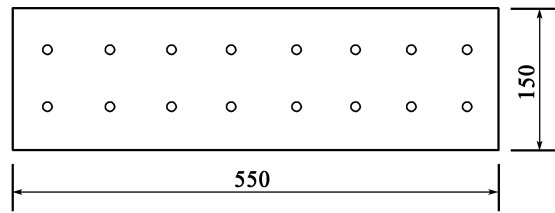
The test point arrangement for rebound measurements (units mm)
